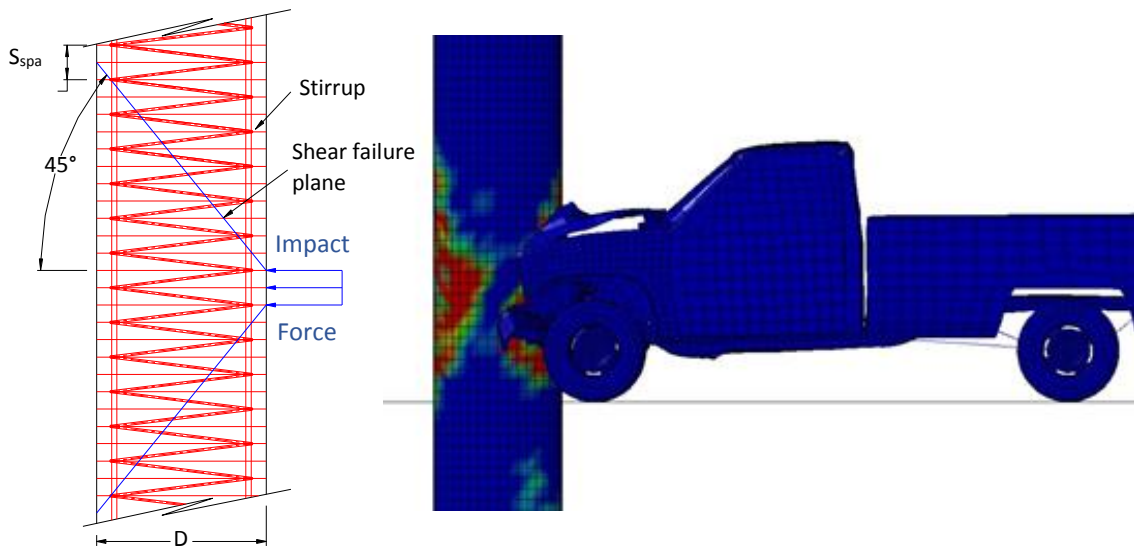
observed failure mechanism from impact force on bridge pier
